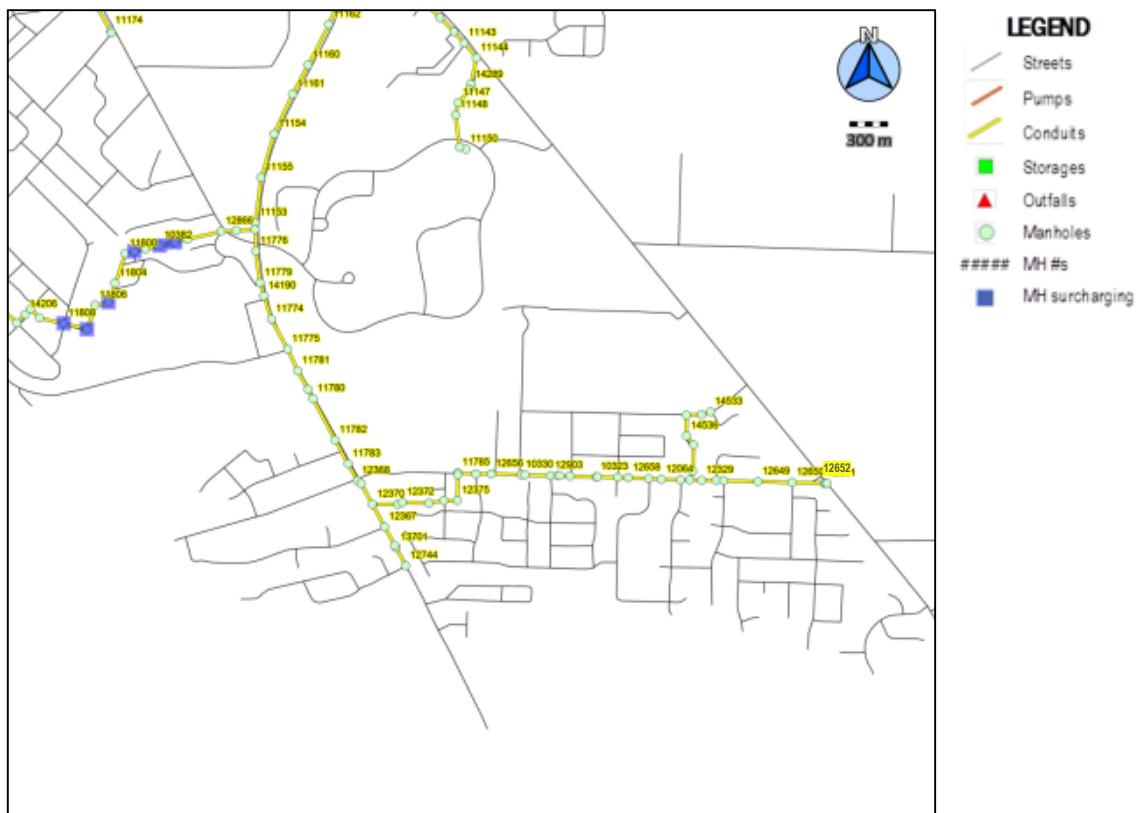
Surcharging (within 5-feet of rim) Along Glen Oak Road – Alternative A
